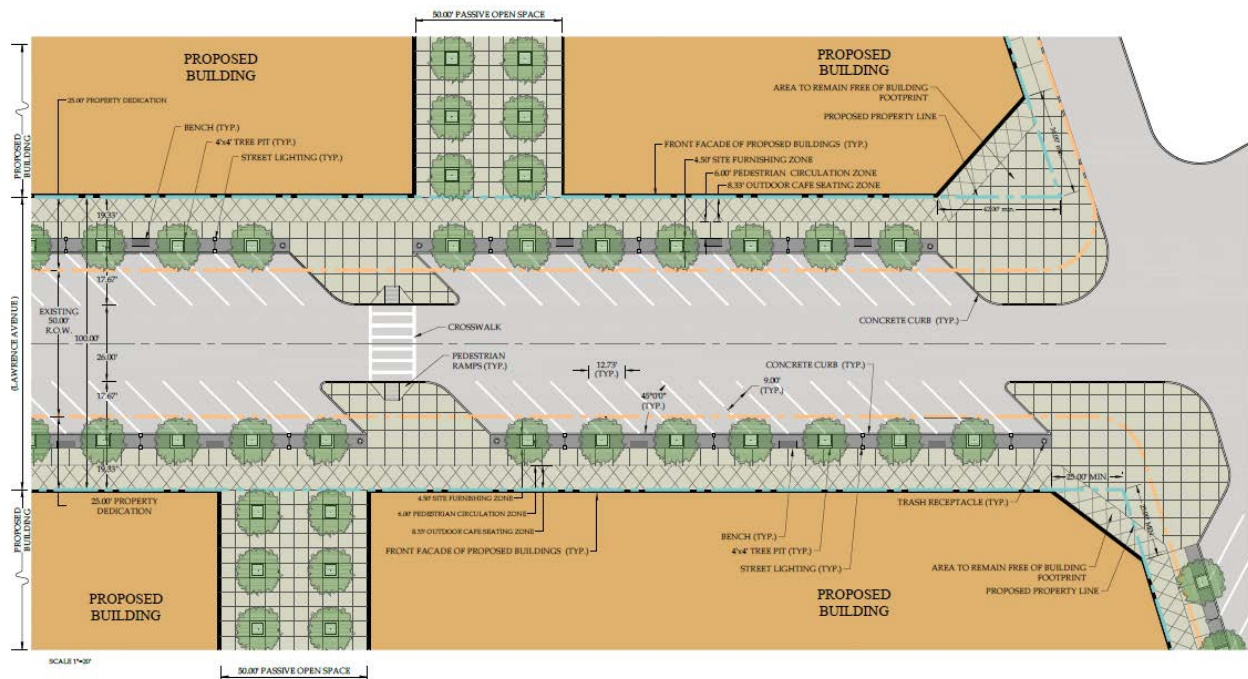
Plan View of Lawrence Avenue R.O.W. Dedication and Potential Streetscape Design
